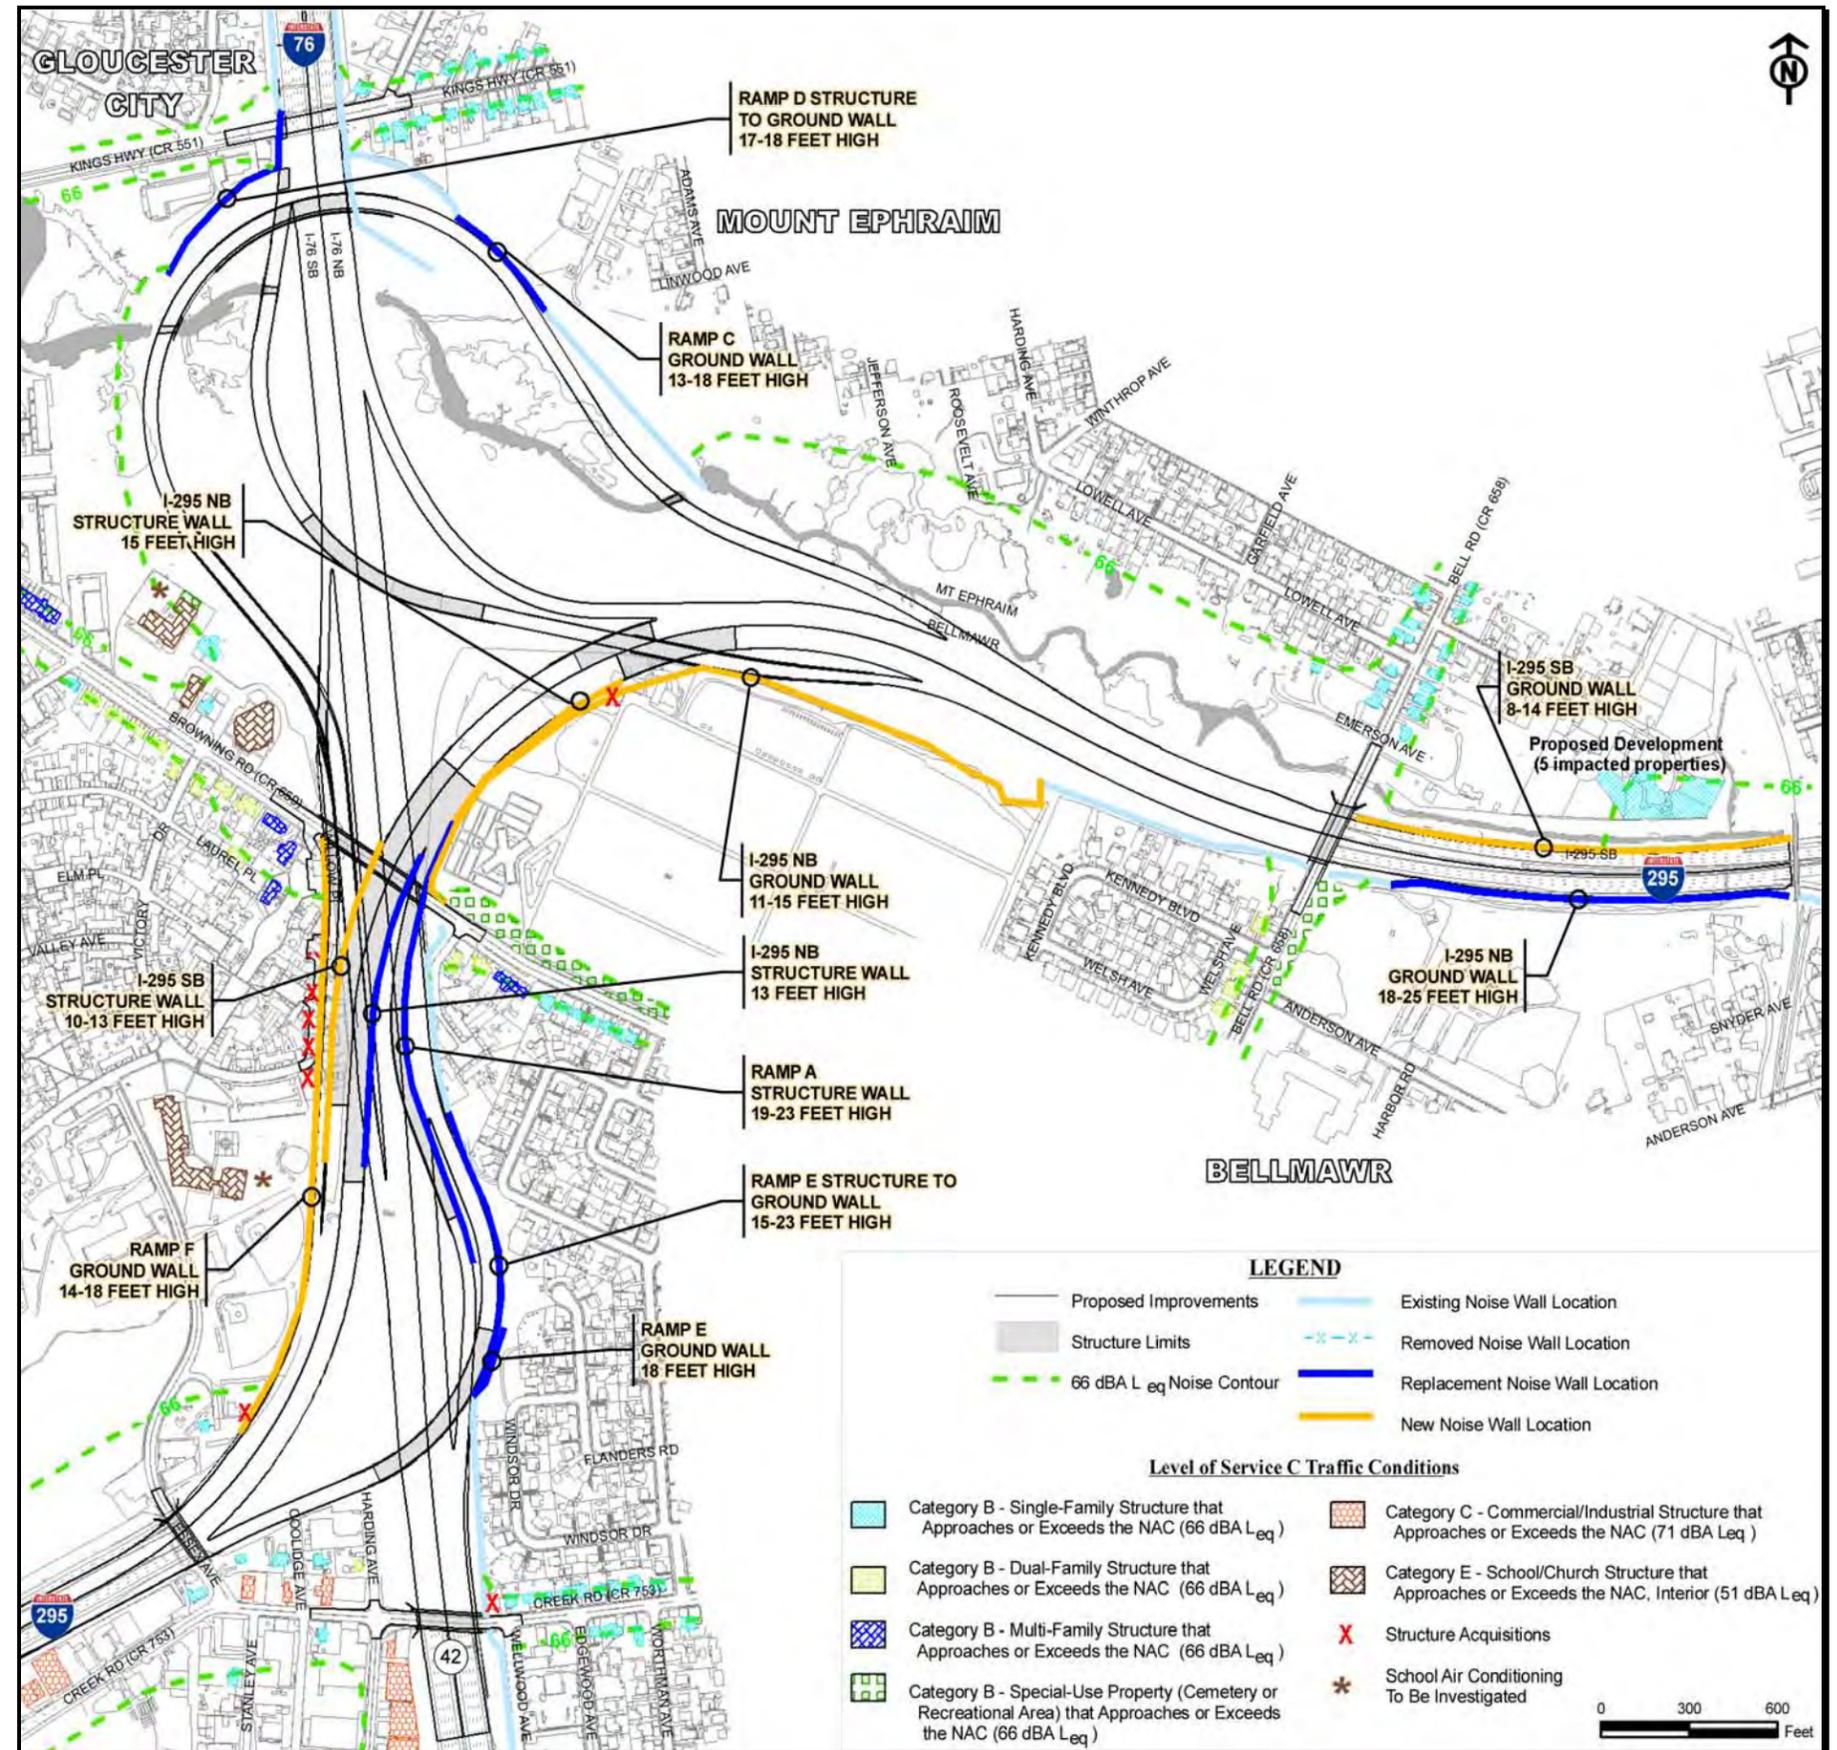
2030 Alternative D1 Proposed Noise Walls
